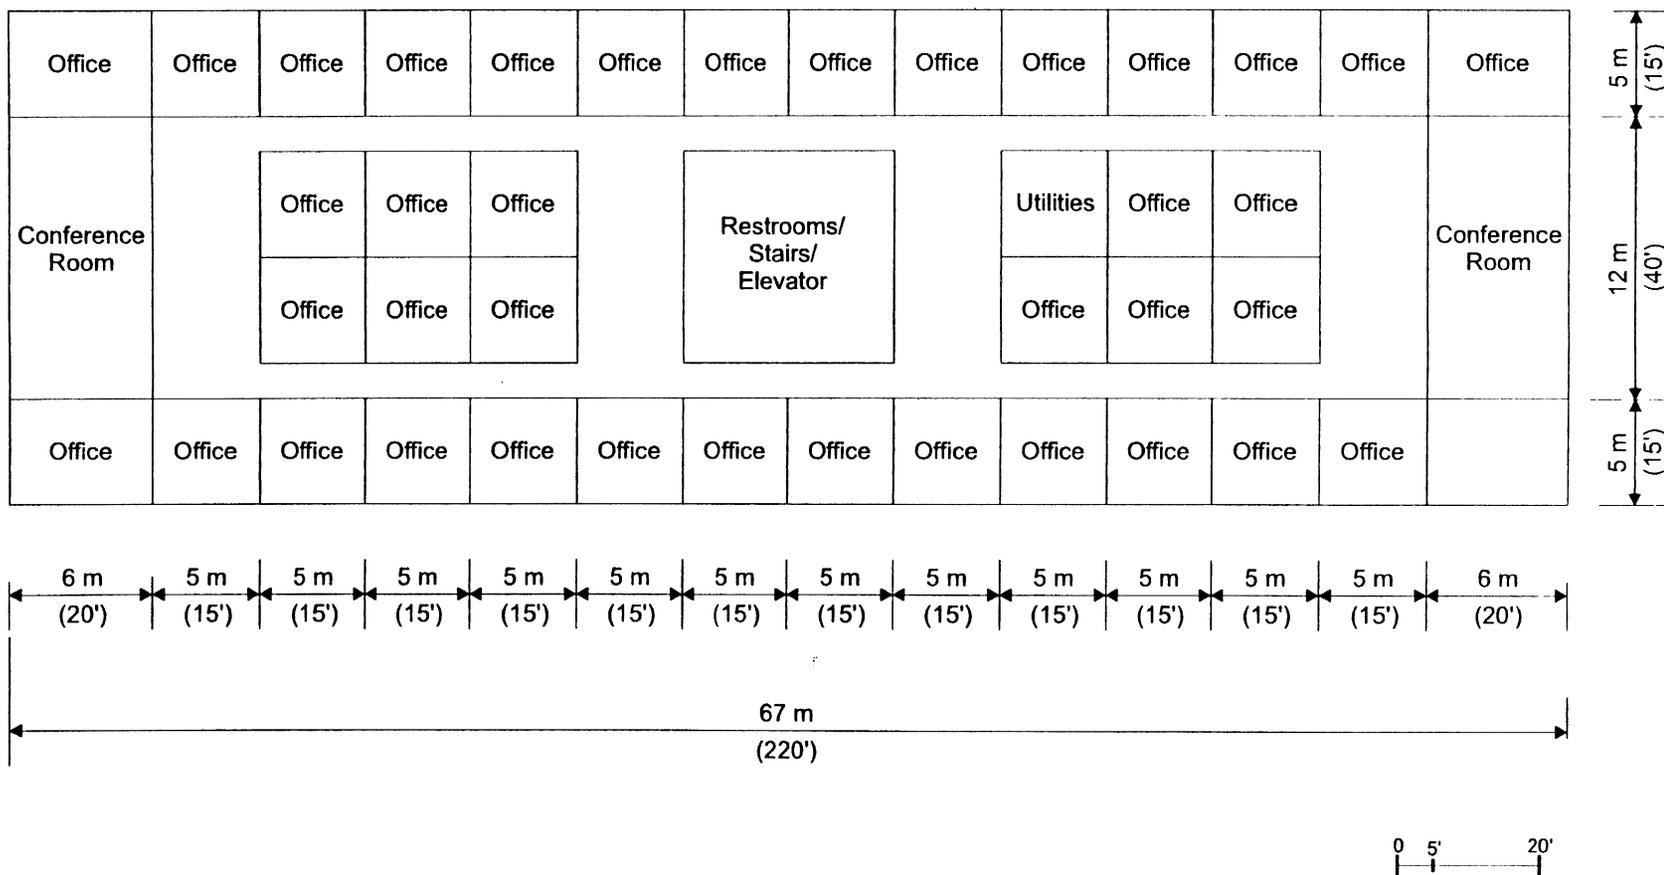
Layout of the Administration and Technical Services Building (ATSB)
